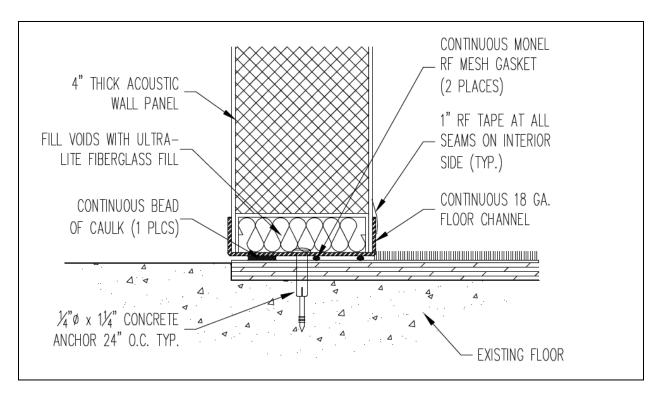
Fabrication details: bottom of wall. (Adapted from Noise Barriers, LLC, 2011.)
